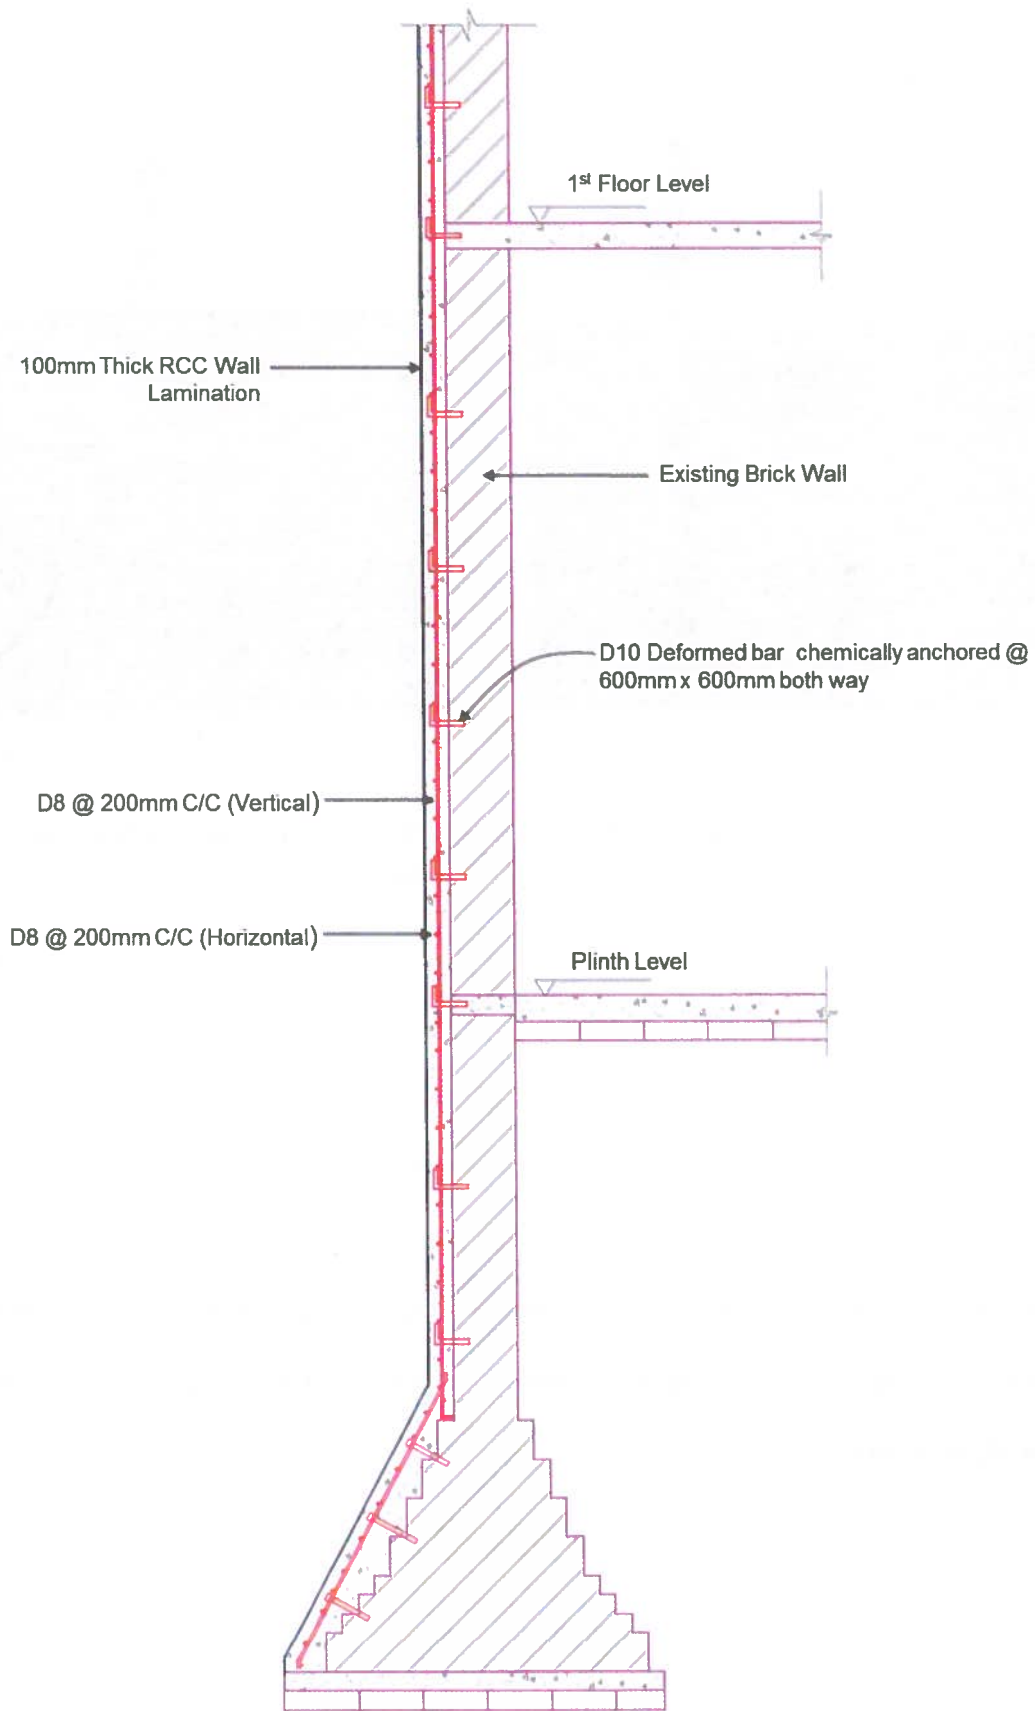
Typical Section of RC Lamination (Drawing for Pilot Work of CNCRP Project)
